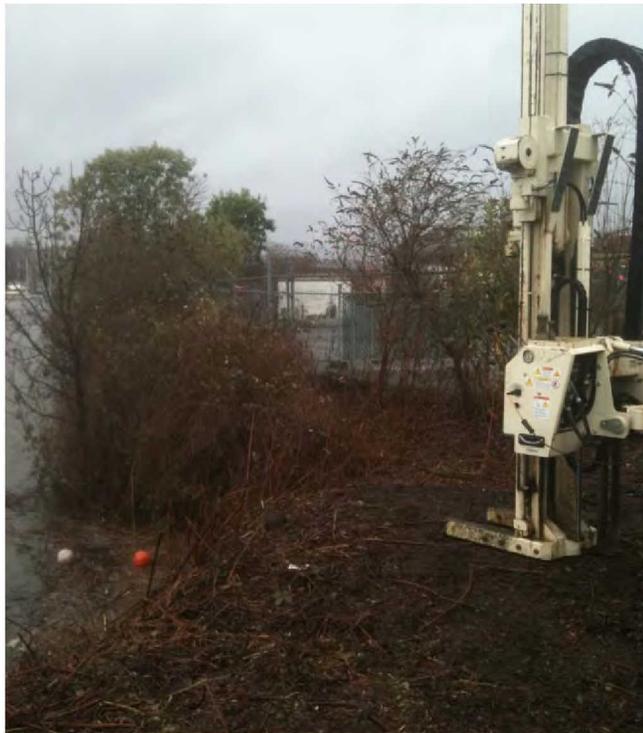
Looking north toward Geoprobe rig positioned at Boring T2B4.
